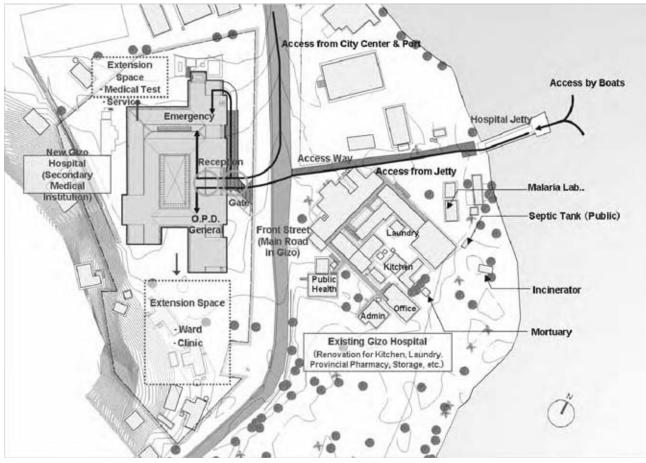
Existing Facilities of Gizo Hospital and Master Plan of Construction Site
